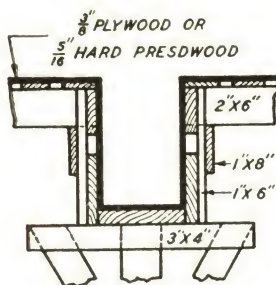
Slab and Beam Forms Lined with Plywood or Masonite
